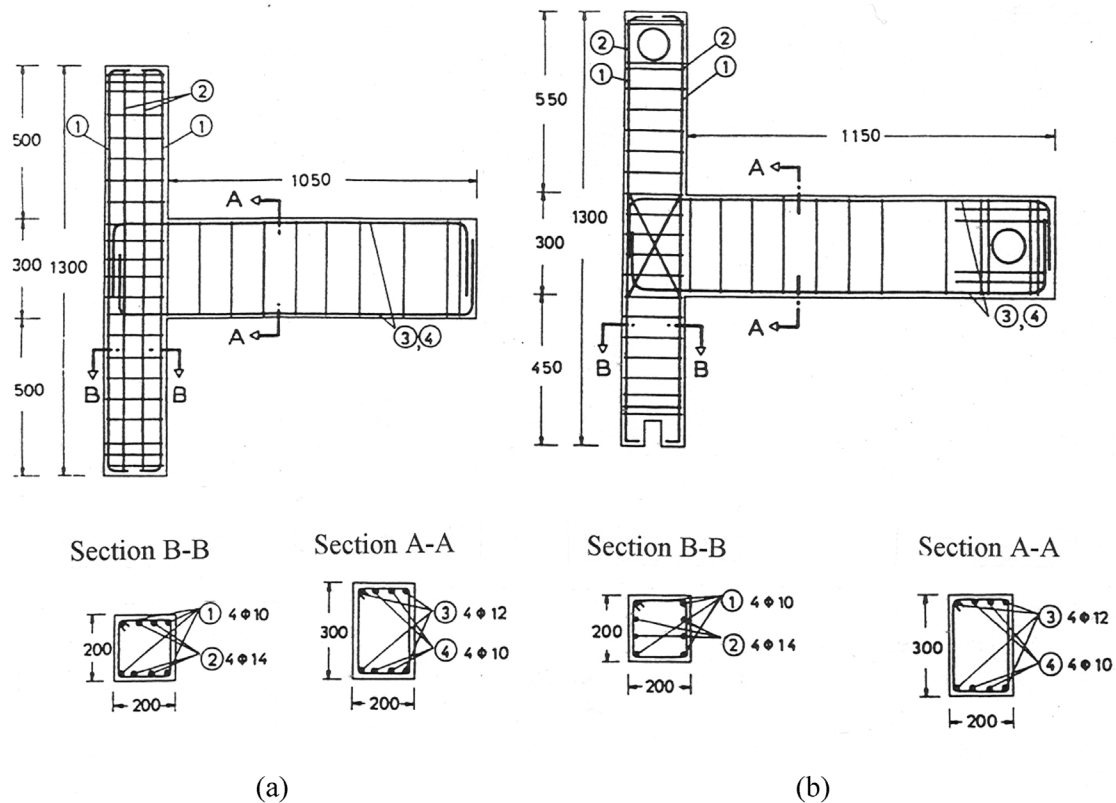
(a) Typical specimen of type A, (b) Typical specimen of type MX (dimensions in mm)
